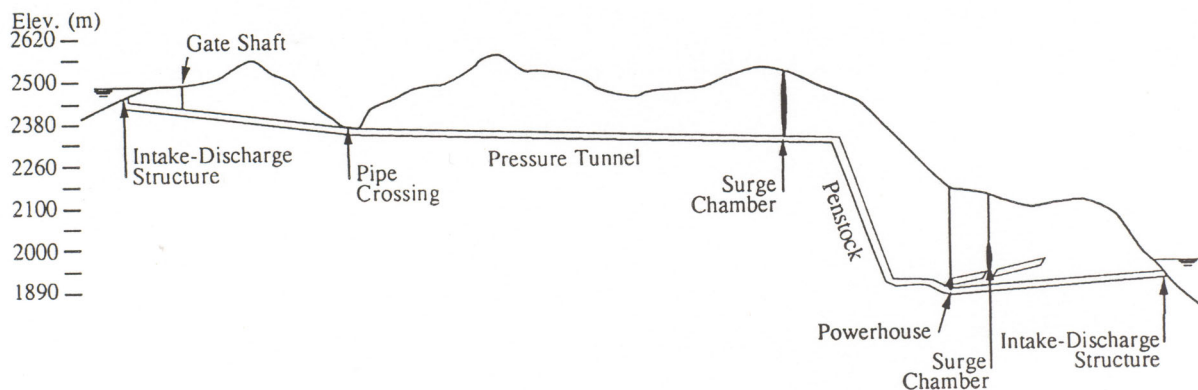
Underground features of the Helms Pumped Water Storage Plant.
